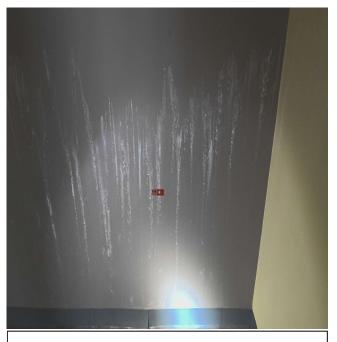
Water damage behind vinyl cove base on fourth floor - August 2025
